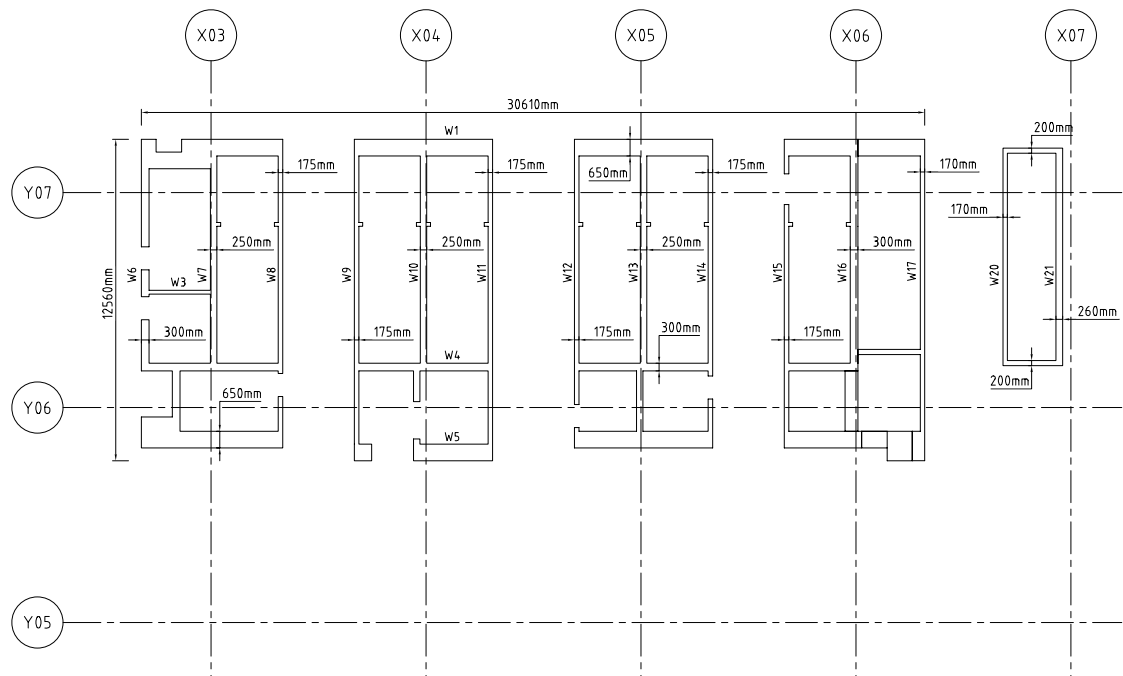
Level 9 Core Plan (Source: Hyder Consulting)
